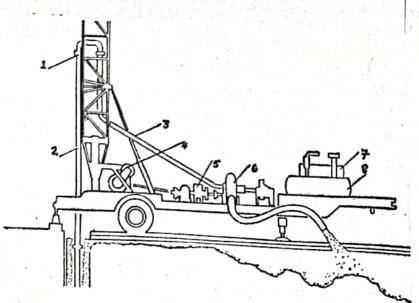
Standard reverse circulation drilling machine. 1-Telescoping kelly and swivel assembly; 2-Square kelly bar; 3-Discharge piping; 4—Draw-works assembly; 5—Vacuum priming pump; 6—Rotary pump; 7-Power unit; 8-Vacuum tank.
